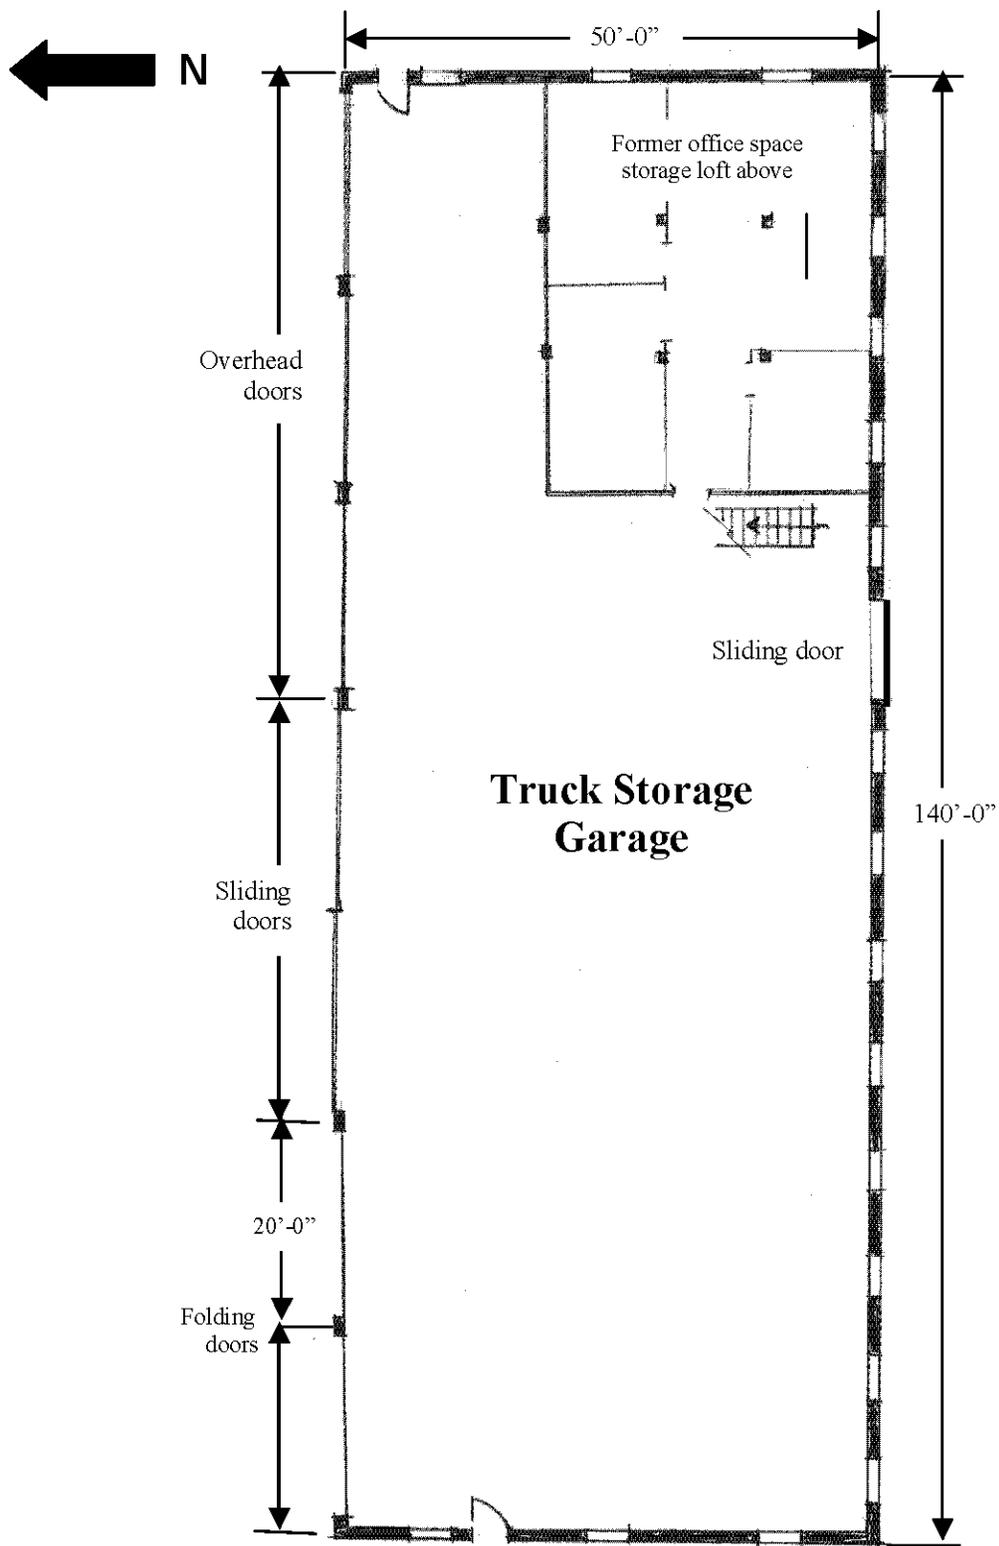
Current floor plan sketch, Donovan and Associates, October 2008.
